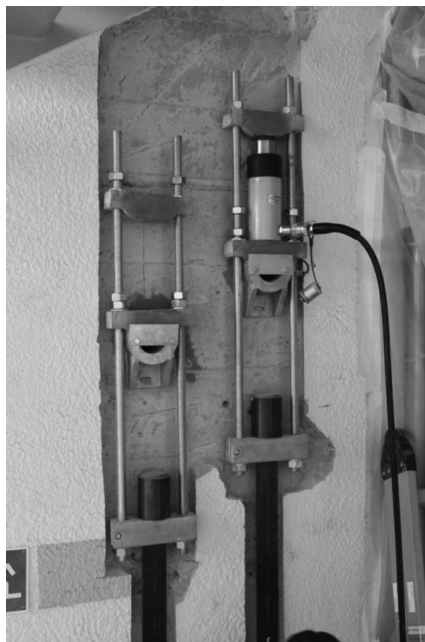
Details of the prestressed strips and their anchorage using CFRP anchor heads. (Photo courtesy of Sika Services AG, Pfäffikon, Switzerland.)
